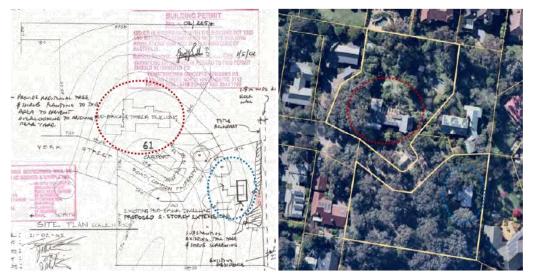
Site plan prepared in 2002, showing the structures of interest (left), and the aerial view of the subject site, with the site boundary outlined in thicker yellow lines (right). Note the house comprising 1948, c1948 and 1959 sections (outlined in red) and a freestanding 1950 pottery now converted to a house (blue). (Source: BP 02/2254; Nearmap 2021)
